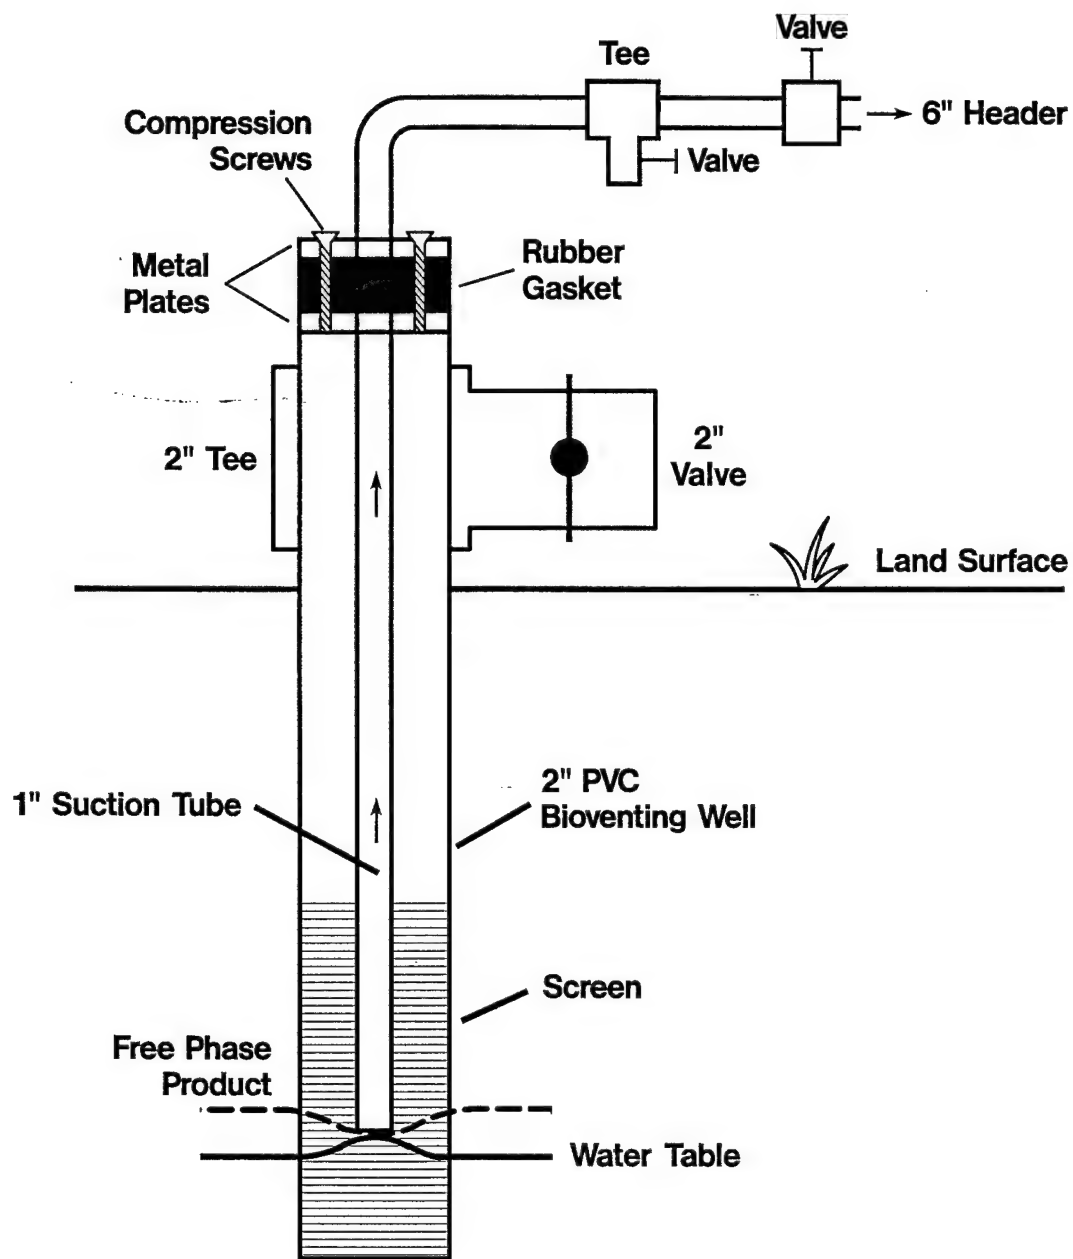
Slurper Tube Placement and Valve Position for the Skimmer Pump Test
